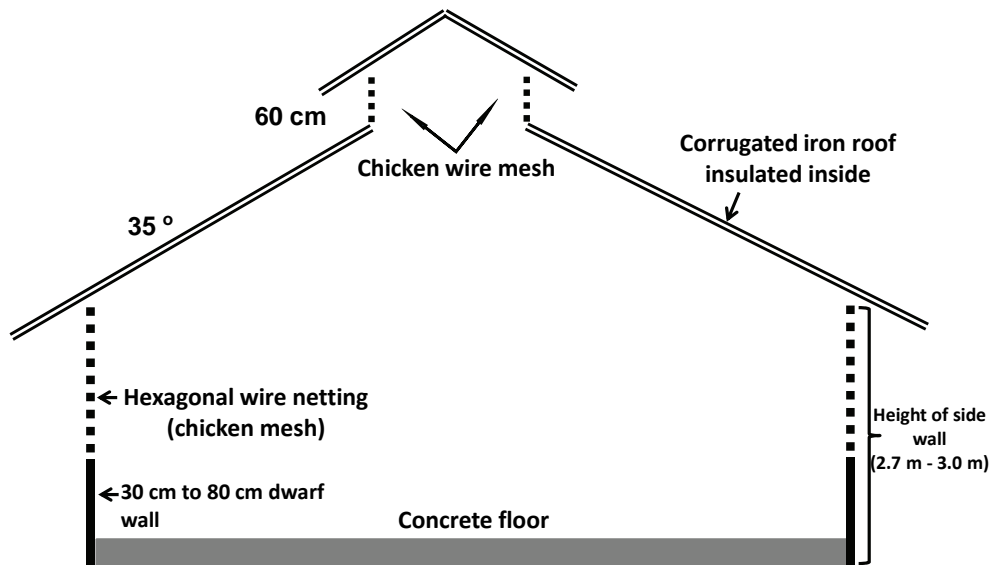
The open-sided poultry house with pitched roof and roof-nook ventilation
